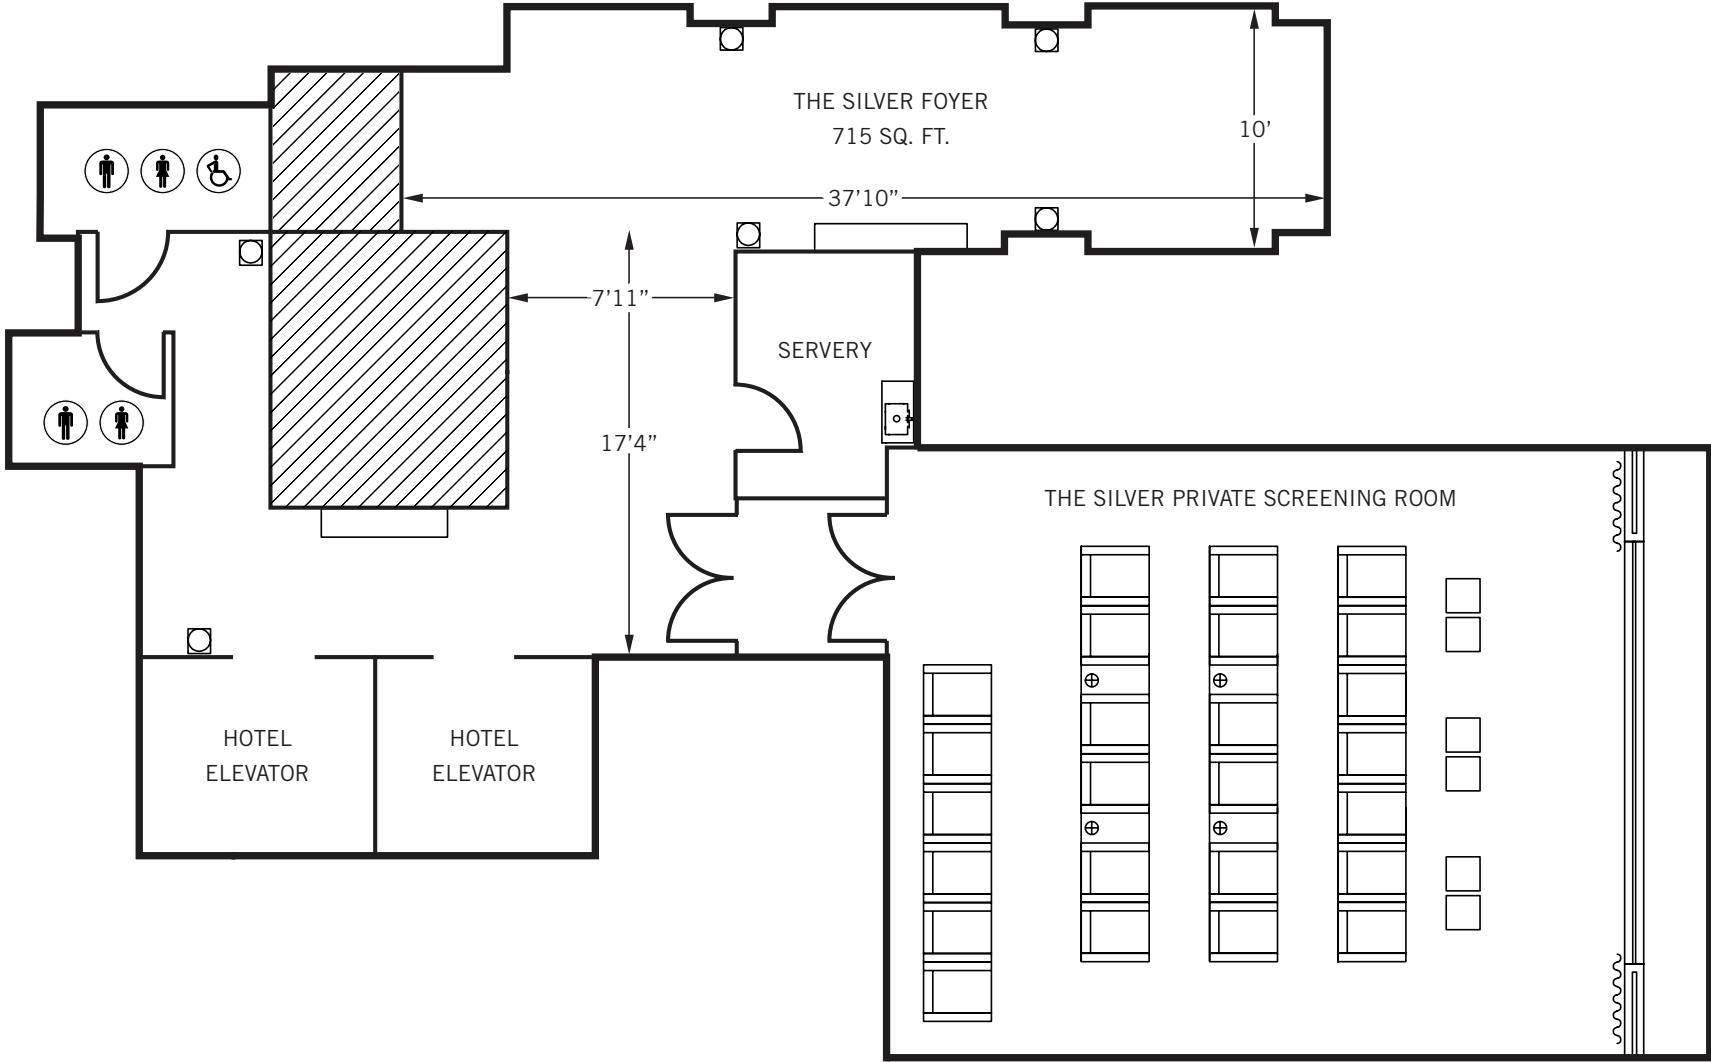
Layout shows screening room layout with a pre-function area (Hazelton Hotel, 2021).
